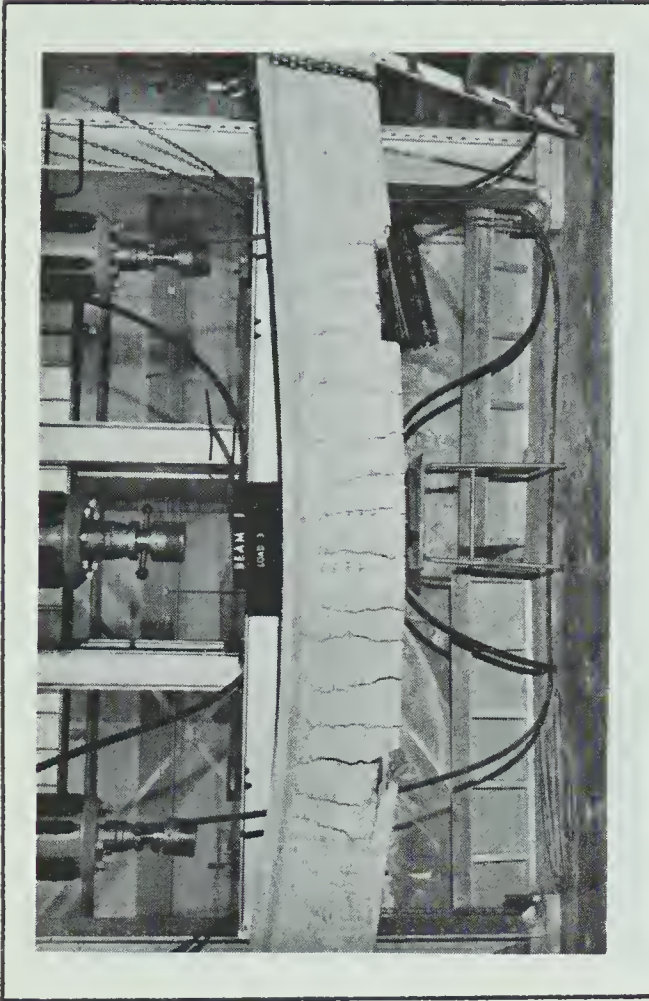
BEAM #2 CRACKING AND FAILURE PATTERNS
